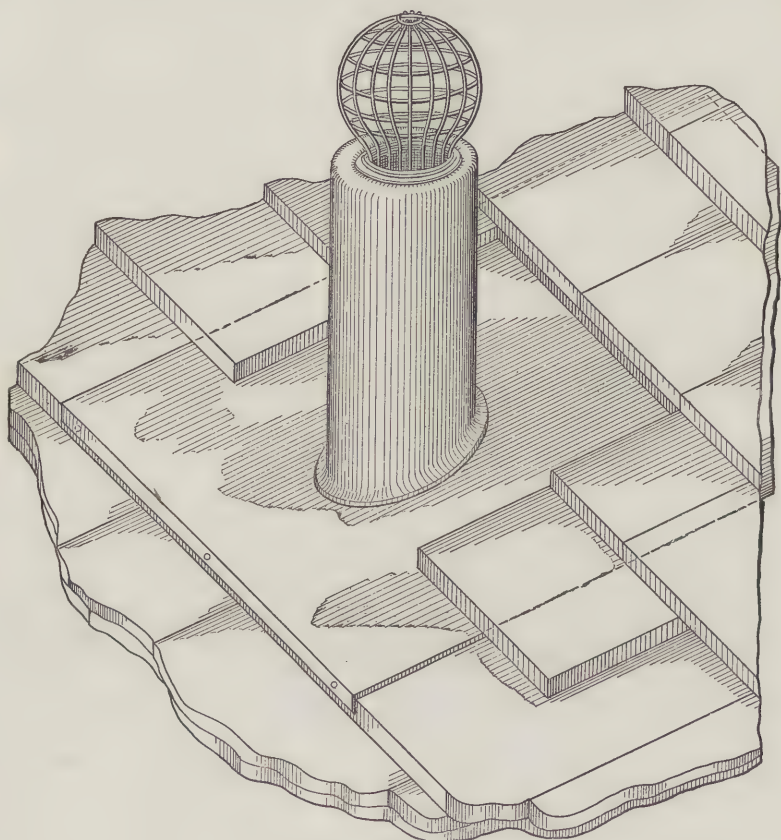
ROOF AND FLASHING PUT ON TOGETHER
